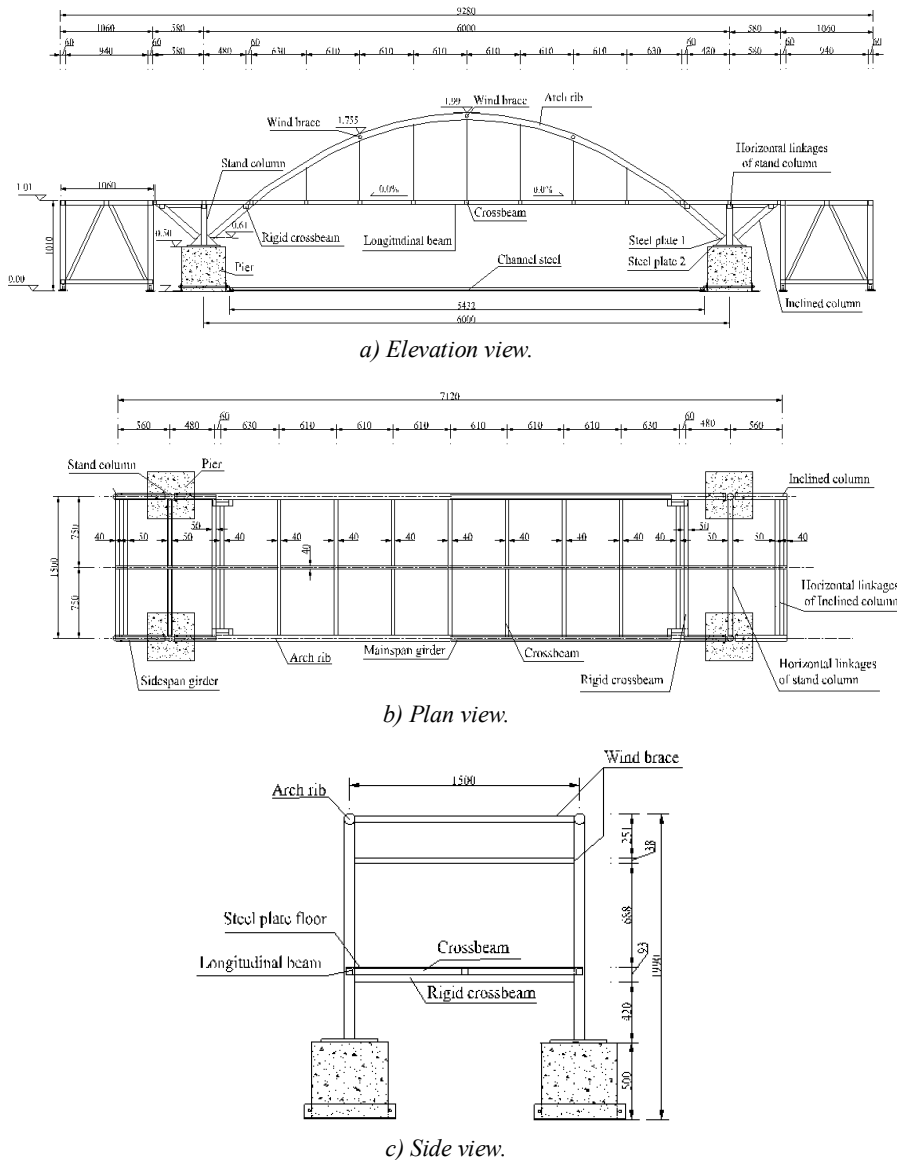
Schematic of technical drawings of scale arch bridge model (unit: mm).
